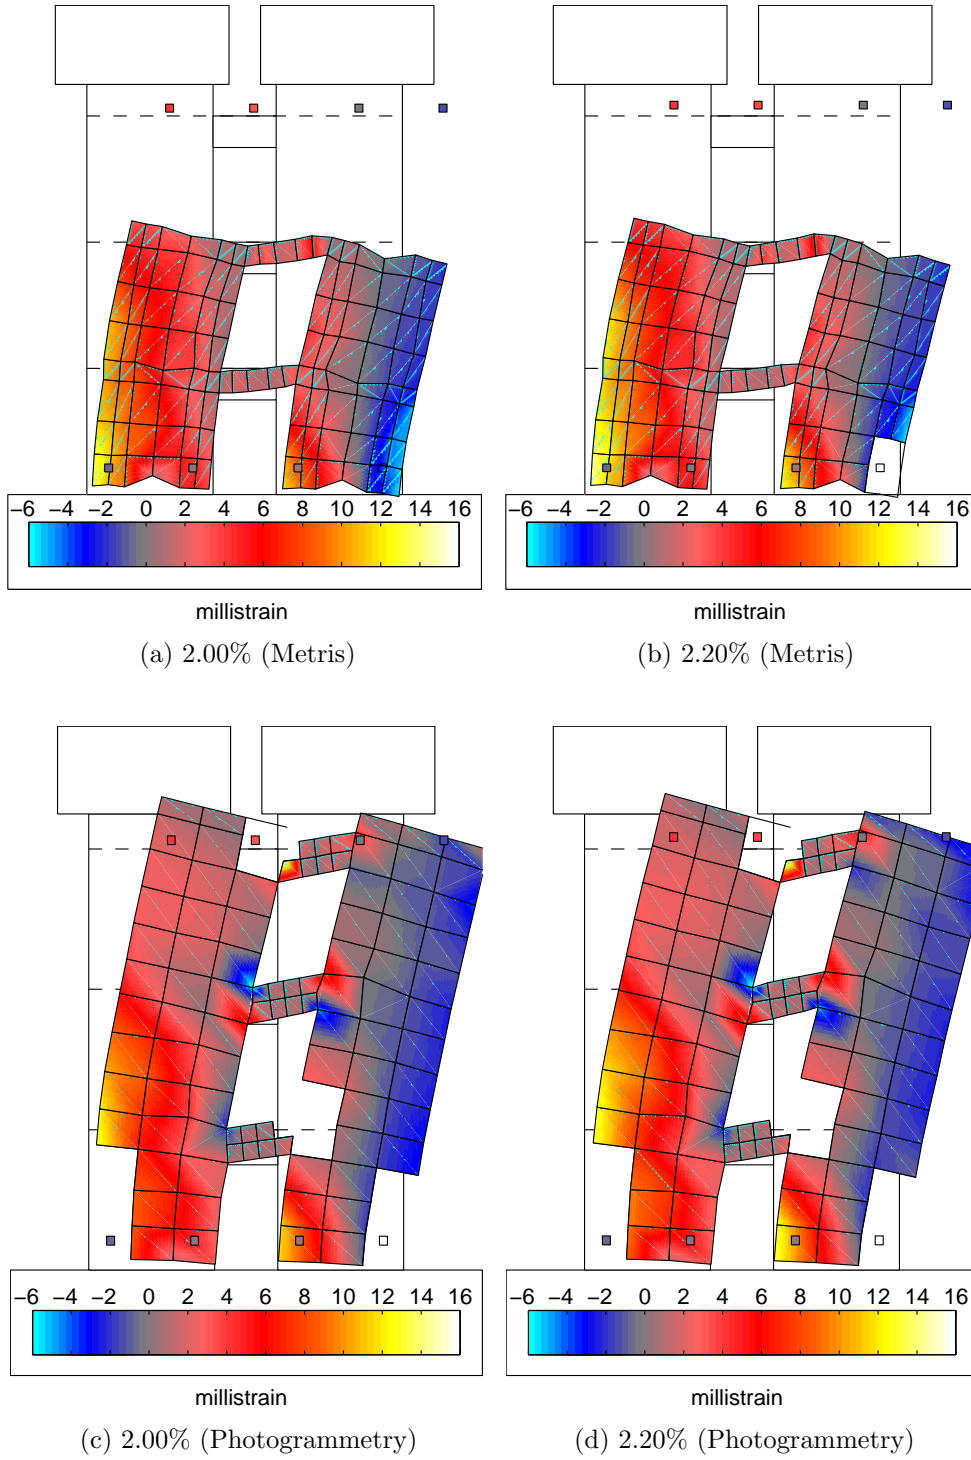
ϵ_z field near failure of the east wall pier (2.25% E+ drift level)
